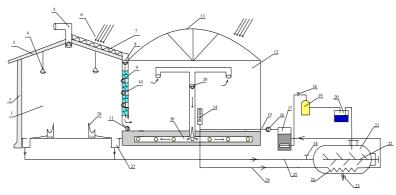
"Livestock-heliogreenhouse complex". 1-livestock building; 2-wall; 3-part of the roof; 4-lighting fixtures; 5-ventilation ducts; 6- sunlight; 7-solar air heating collector; 8-hot air supply fan in
